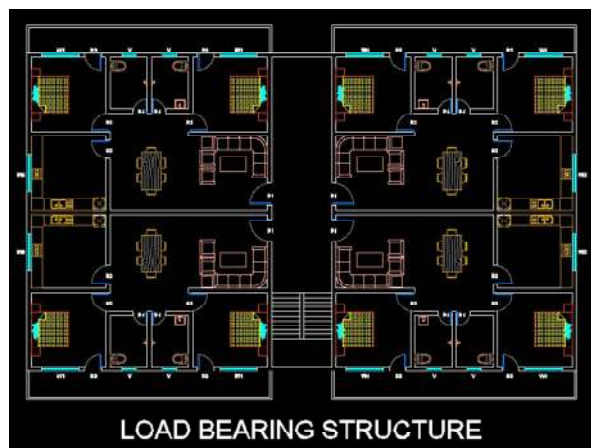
A Typical working drawing of the building plan of the Load Bearing structure
